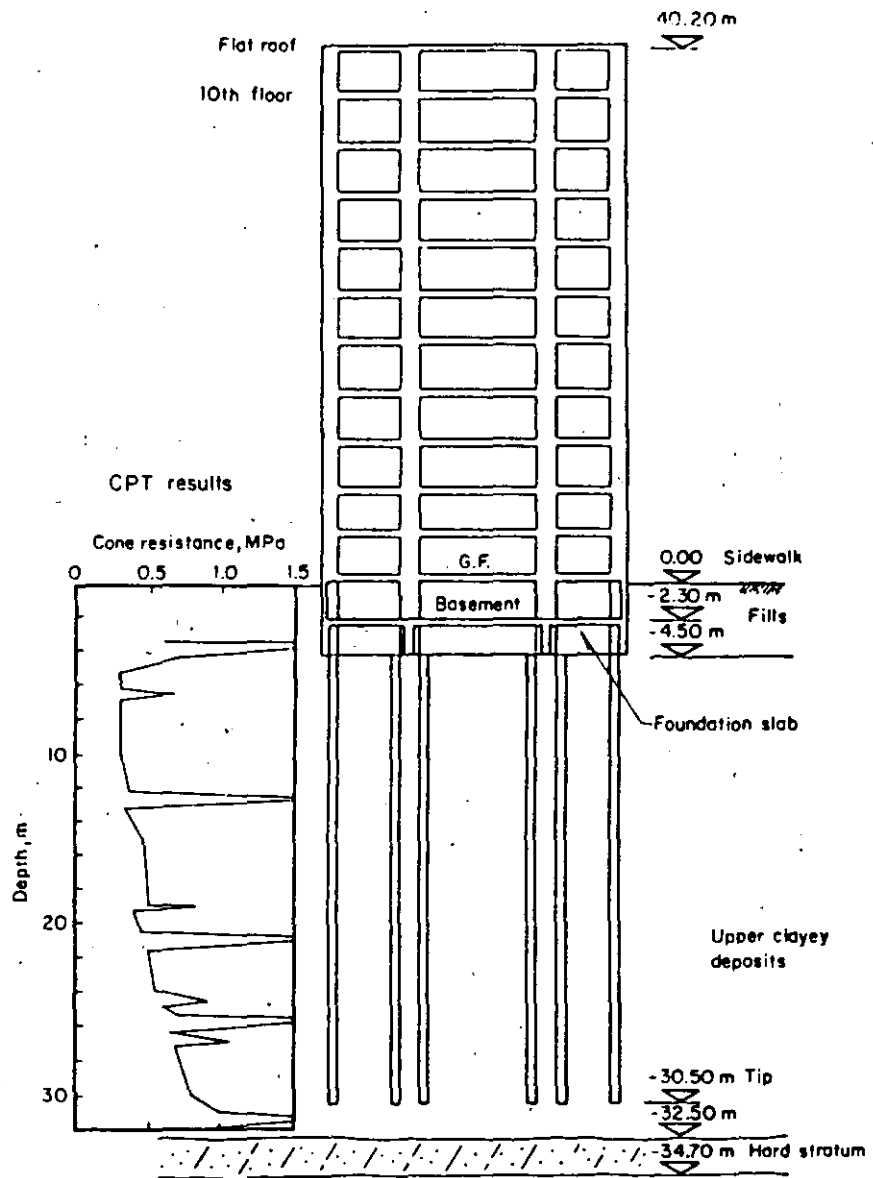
Elevation of the Building IV including foundation and geotechnical conditions.
